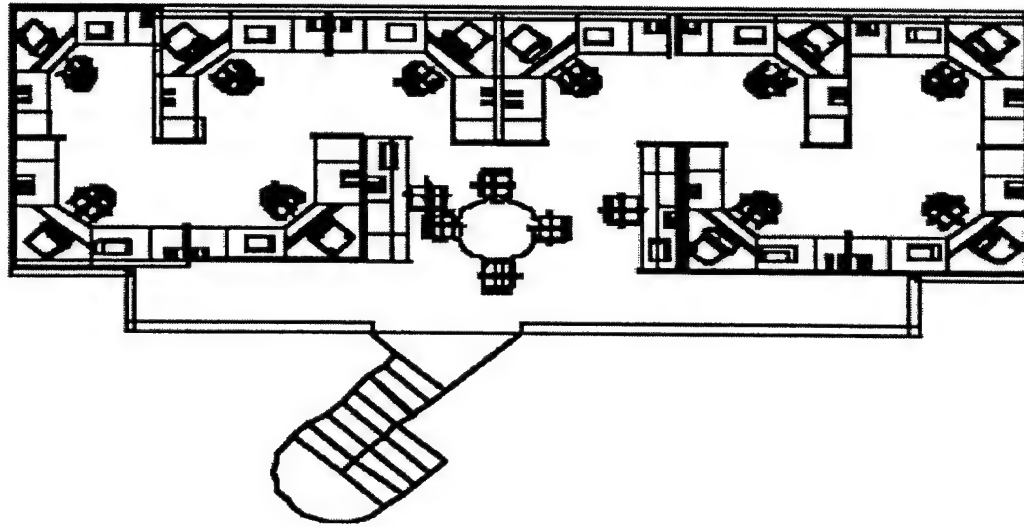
Second Floor Mezzanine Layout: Workstation Areas
